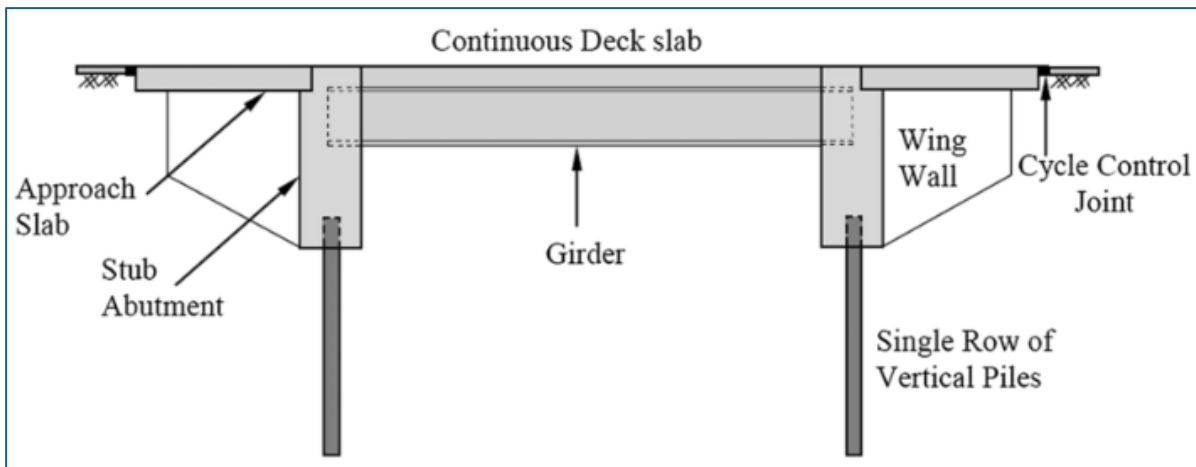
Conceptual Stylised Section of Temporary Single Span Bridge
